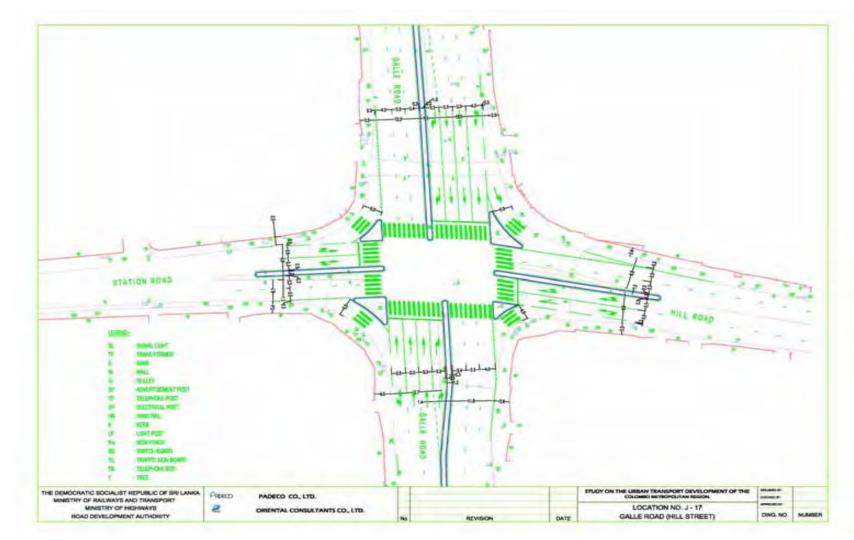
Proposed Geometric Improvements to Hill Street Intersection
